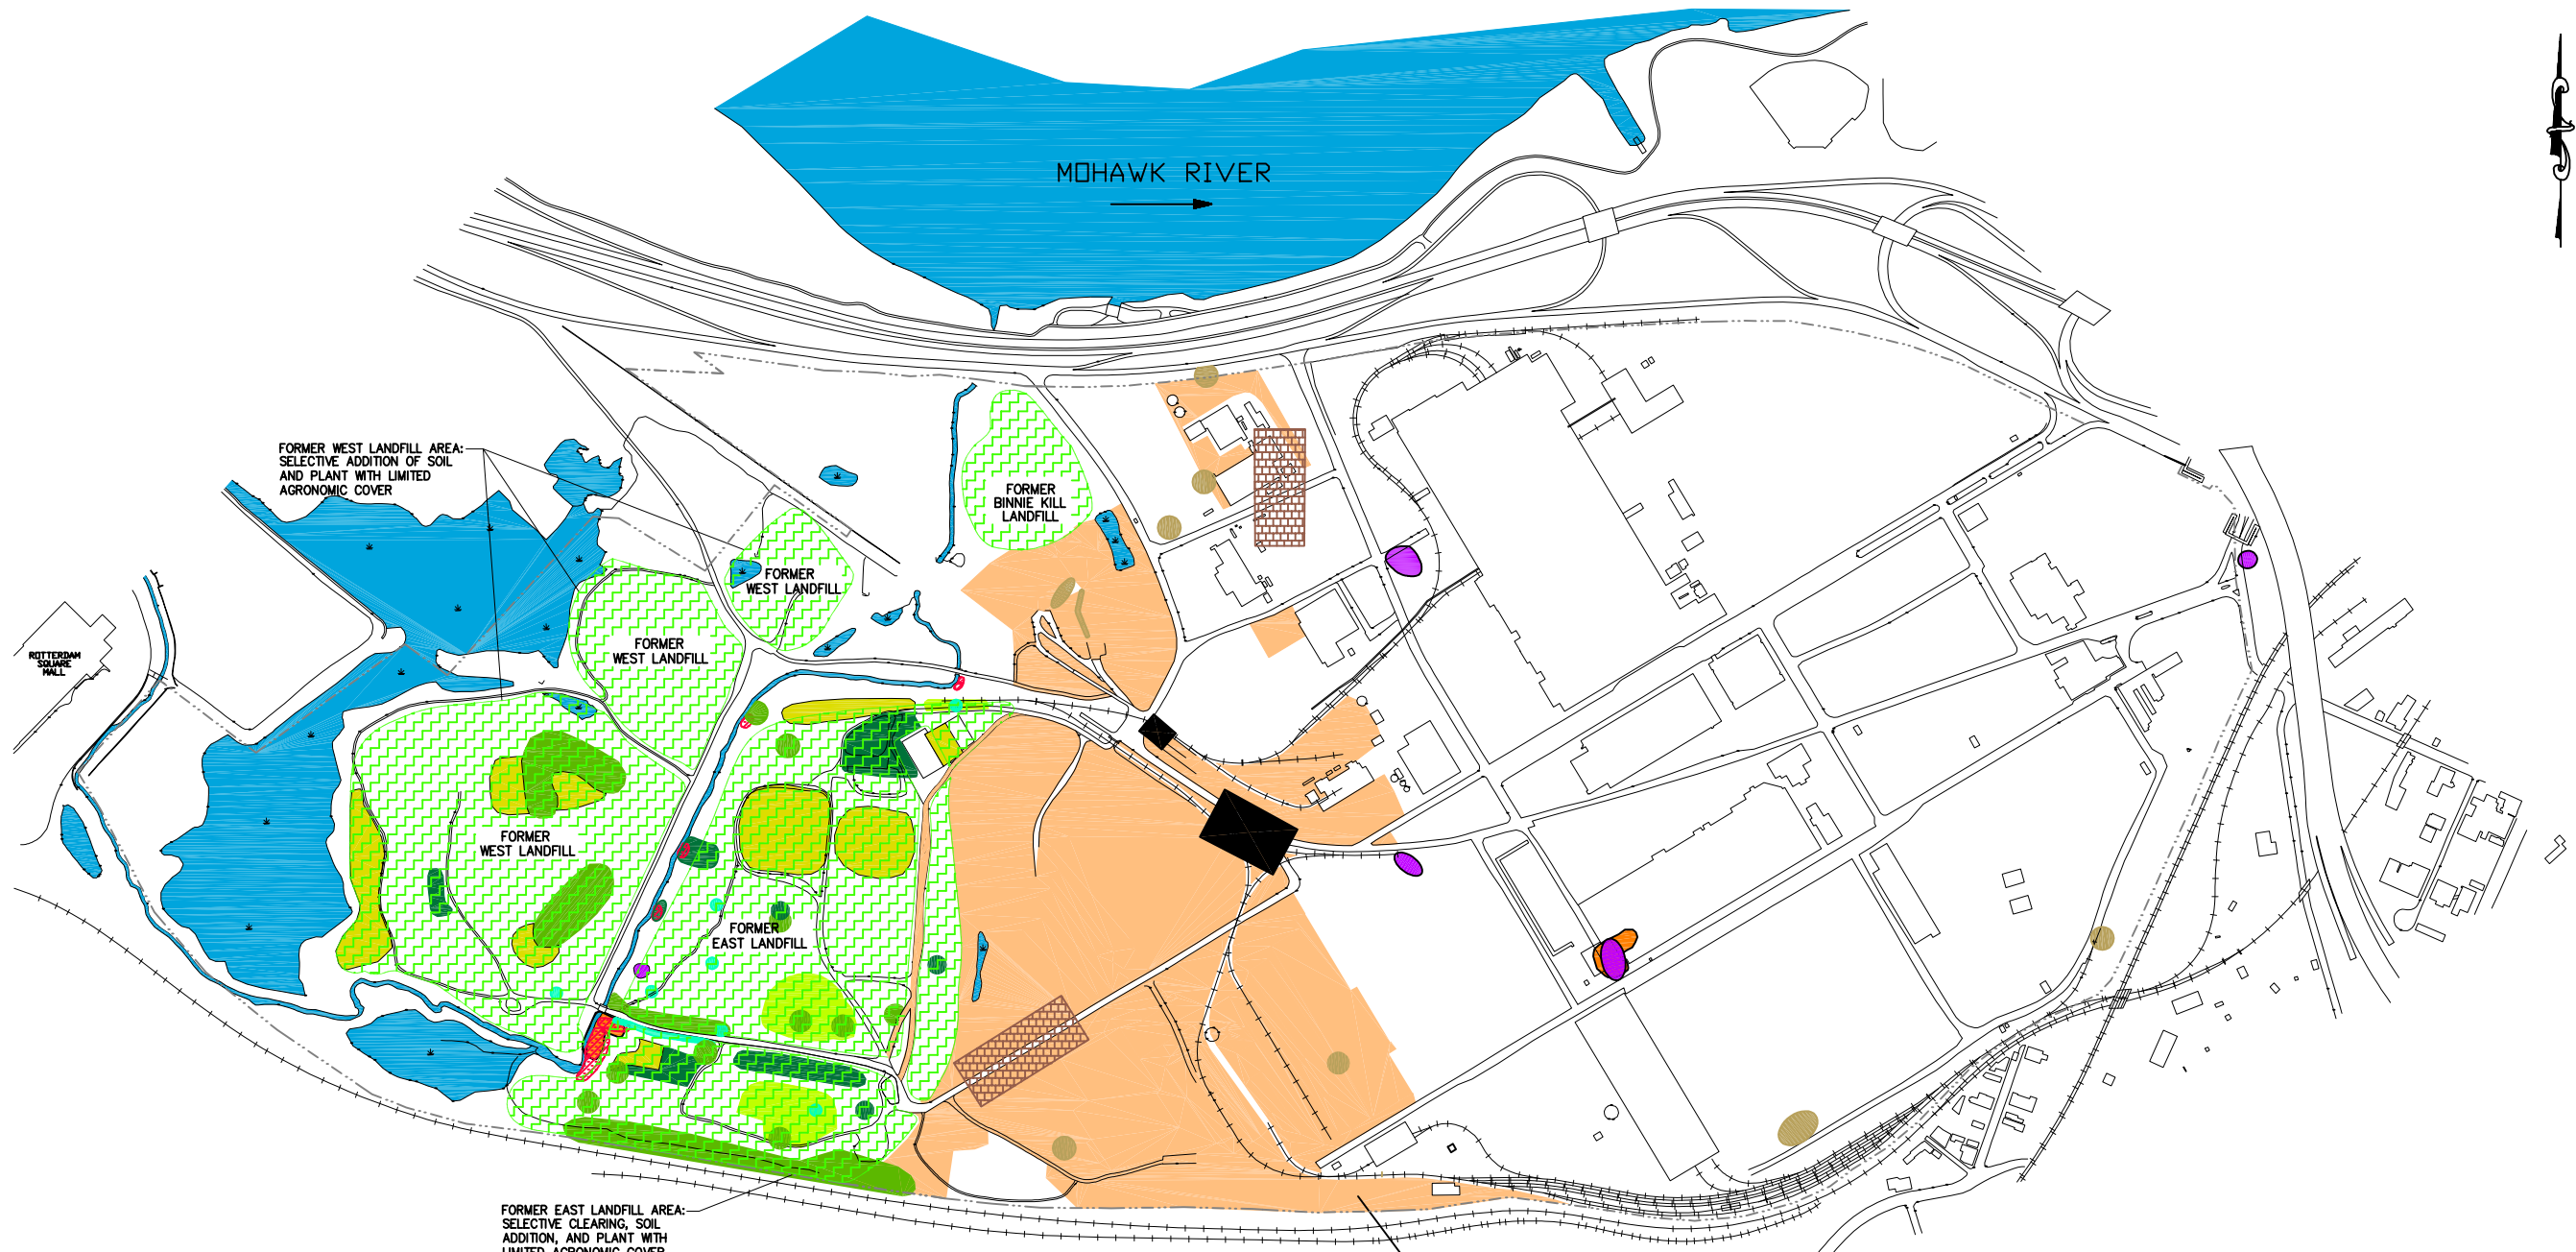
ALTERNATIVE 2 PLAN VIEW
